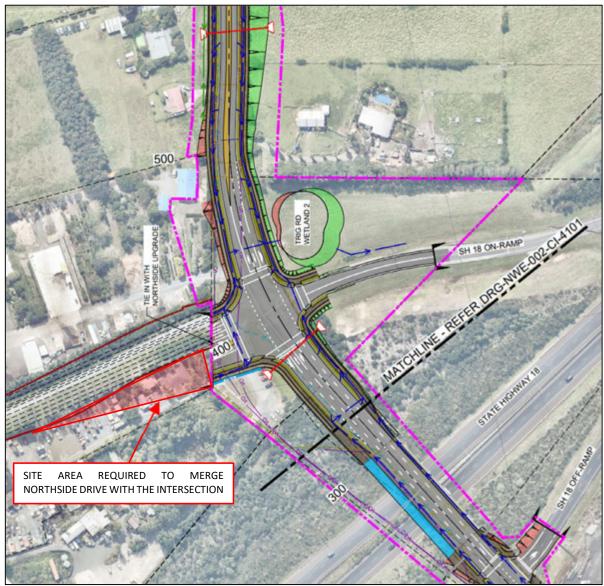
Trig Road Upgrade General Arrangement Layout Plan
